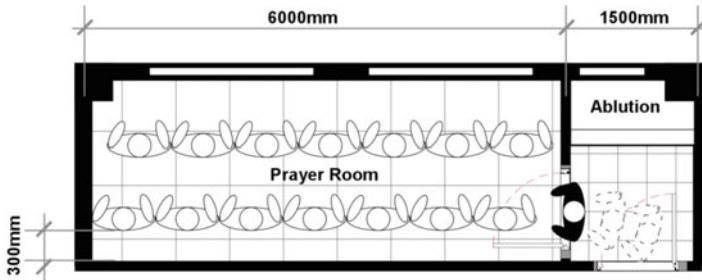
Prayer room layout plan (Source: Abu Bakar Abd Hamid)
